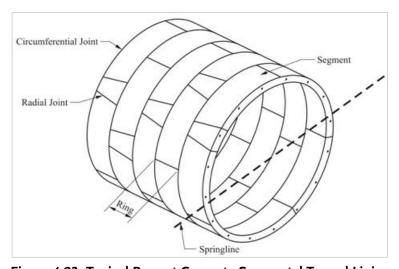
Typical Precast Concrete Segmental Tunnel Lining
